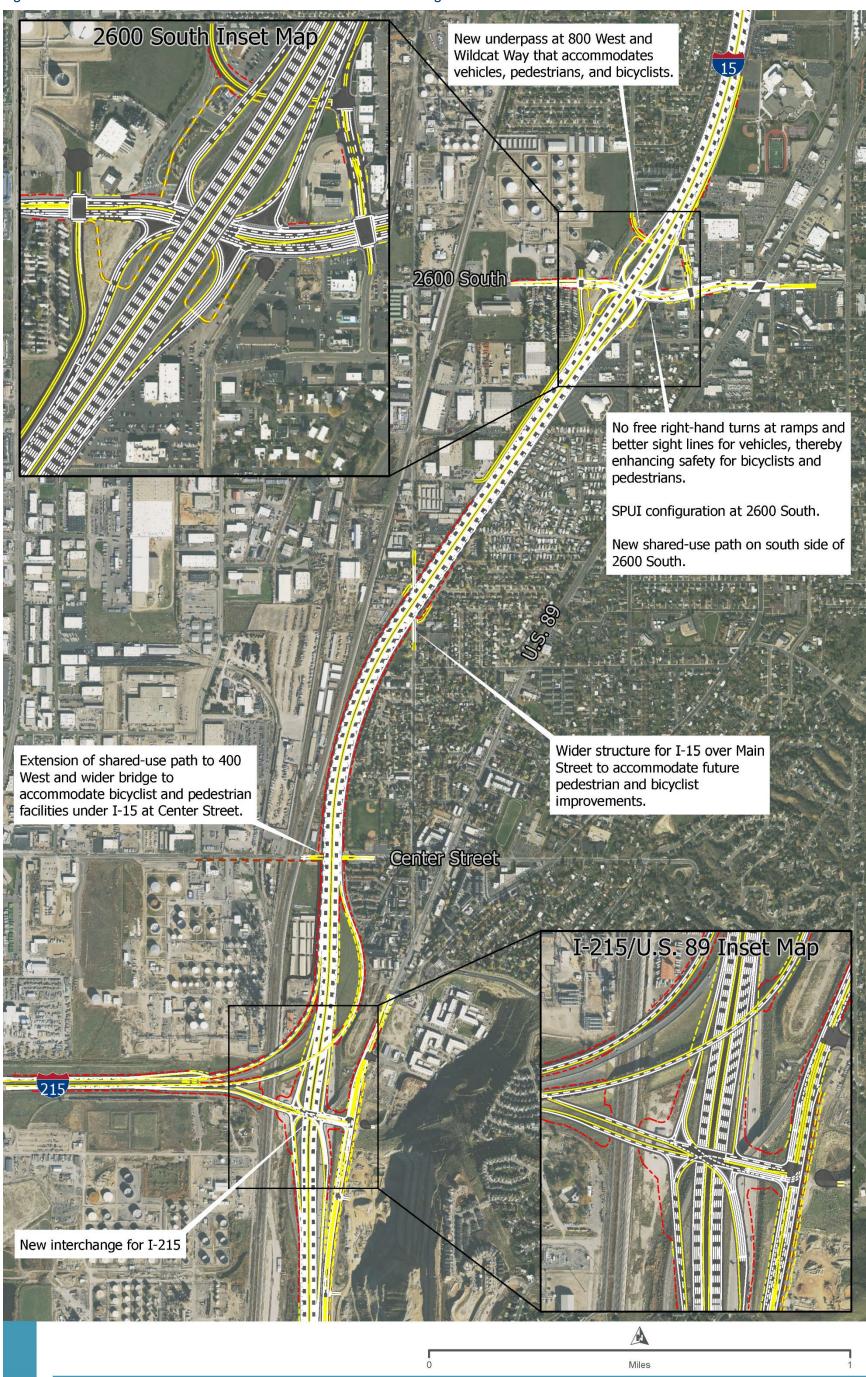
Action Alternative: Center Street North Salt Lake
